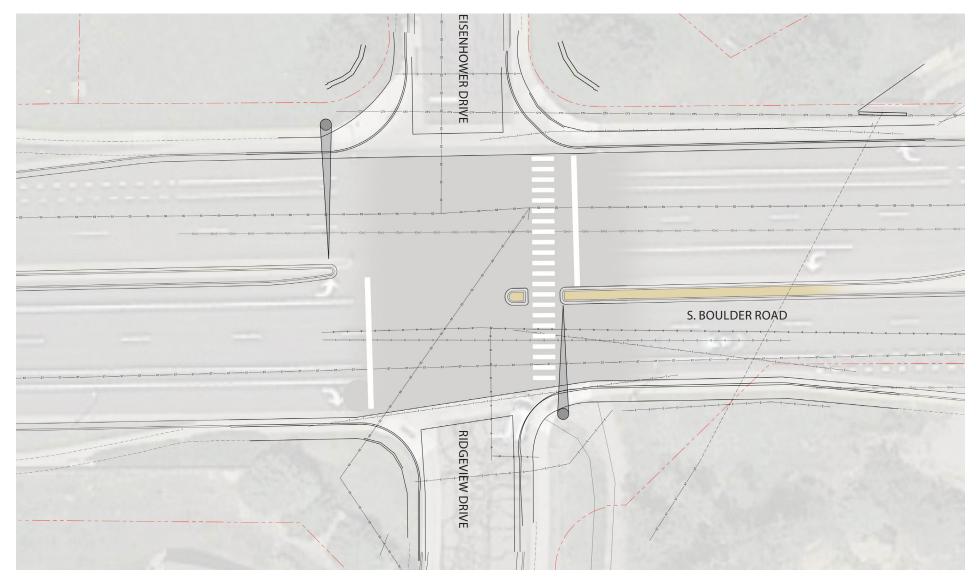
Eisenhower Drive At-Grade Intersection Improvements
